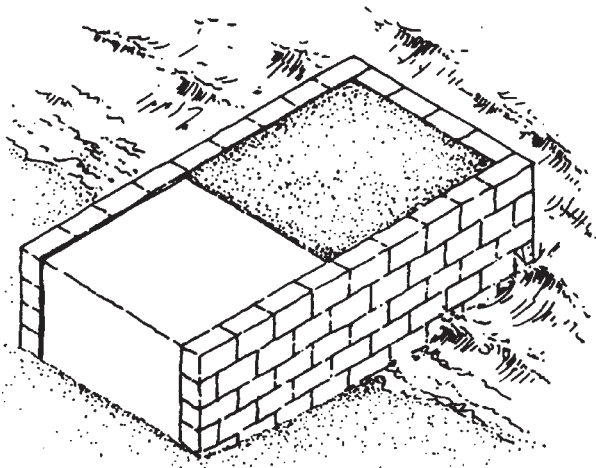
Category 3 form, stage 3, after Vitruvius 5.12.4: "Then the sloping section is to be filled in with sand and brought up to the level of the retaining walls and platform surface" (C. J. Brandon).
